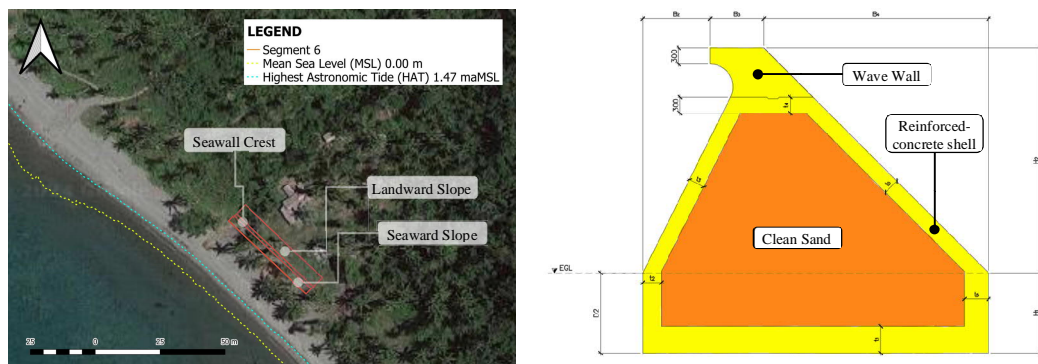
Plan alignment of Segment 6 and typical section of gravity-type seawall.
